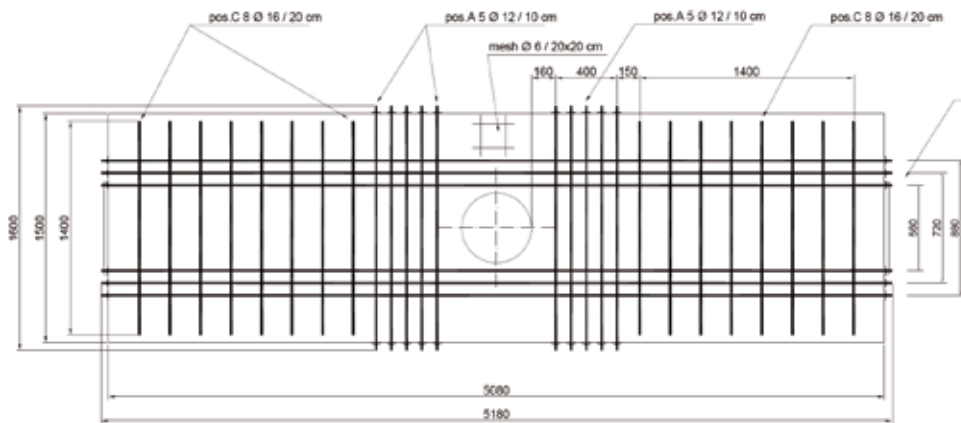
Plan view of the internal Type 2 specimen with profiled steel sheeting
